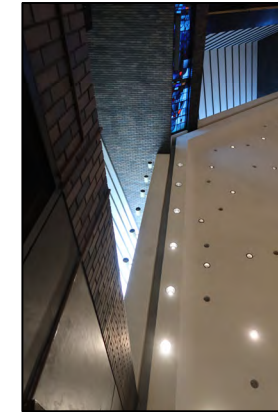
Looking upward to the perimeter outside of the ceiling sprayed area
